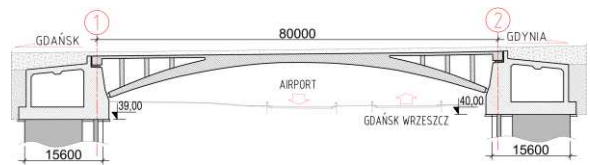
Overall scheme of longitudinal section of the railway viaduct structure
